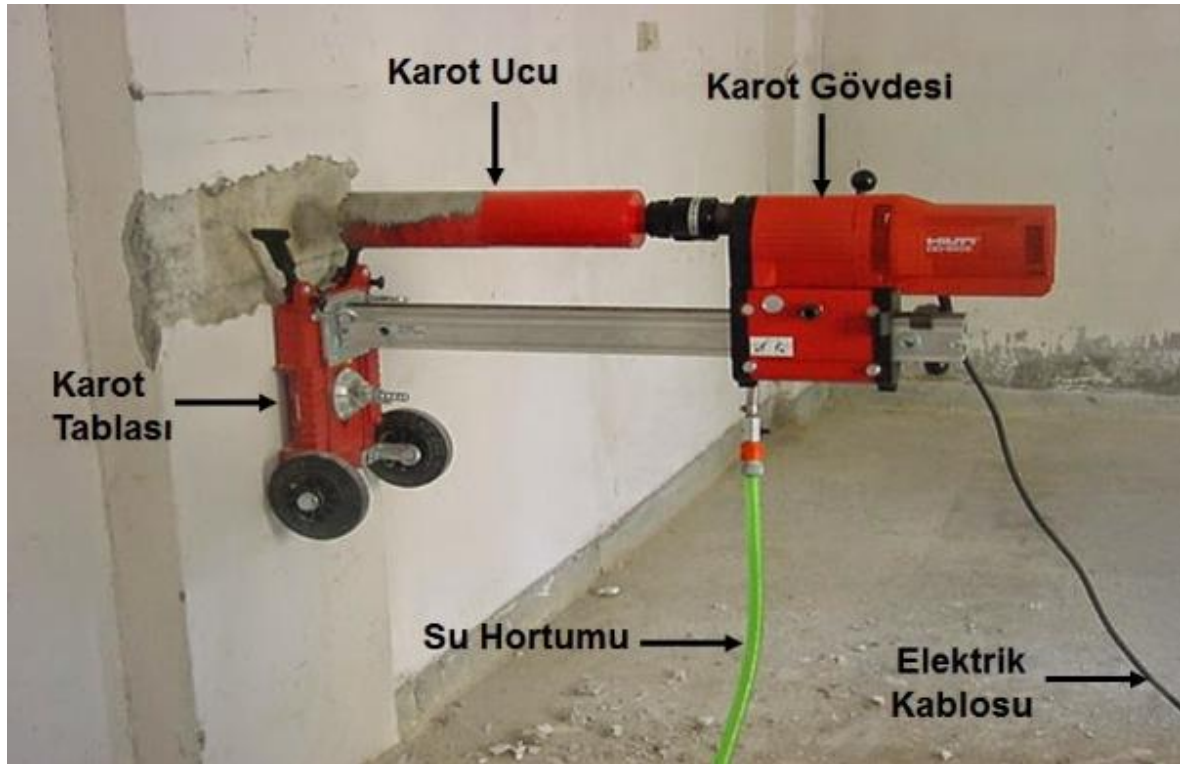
Concrete core drilling machine (Karot Nedir?. (2019).)
